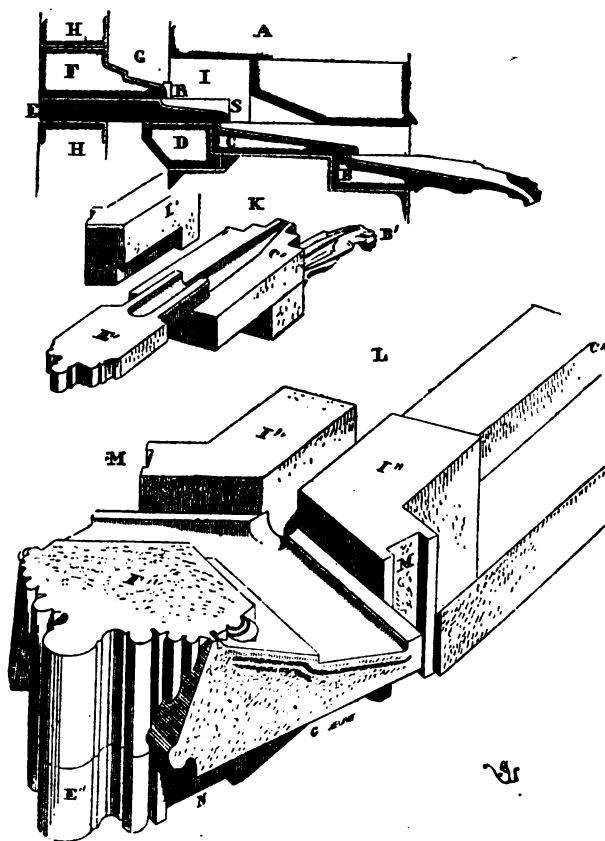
Detail of Pier and Buttress, St. Urbain, Troyes.
